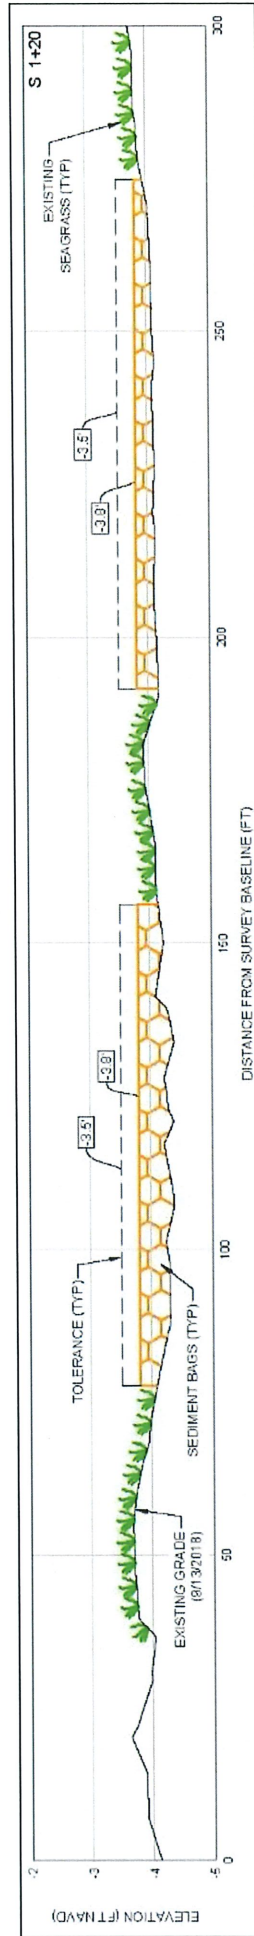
Typical Cross Section of Permitted Mitigation Site South
